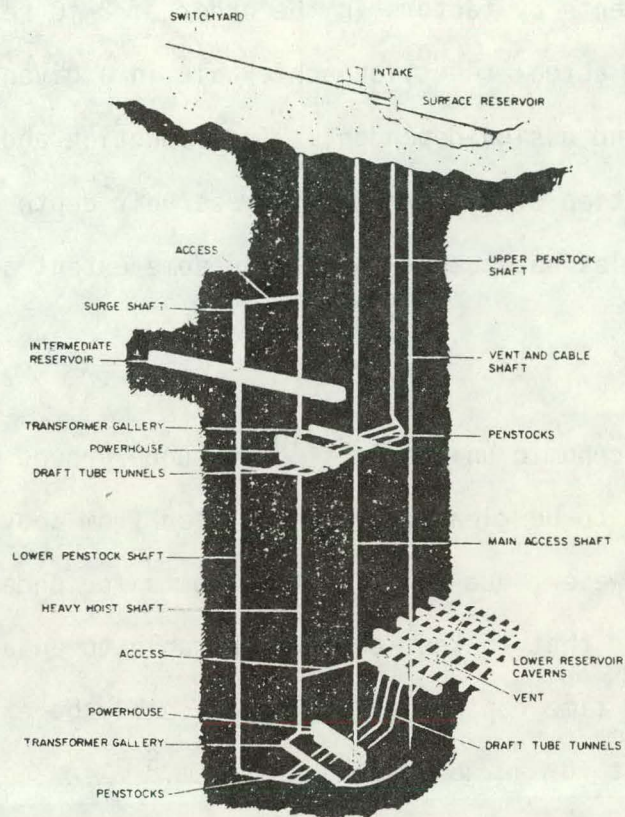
UNDERGROUND PUMPED HYDRO CONCEPT
